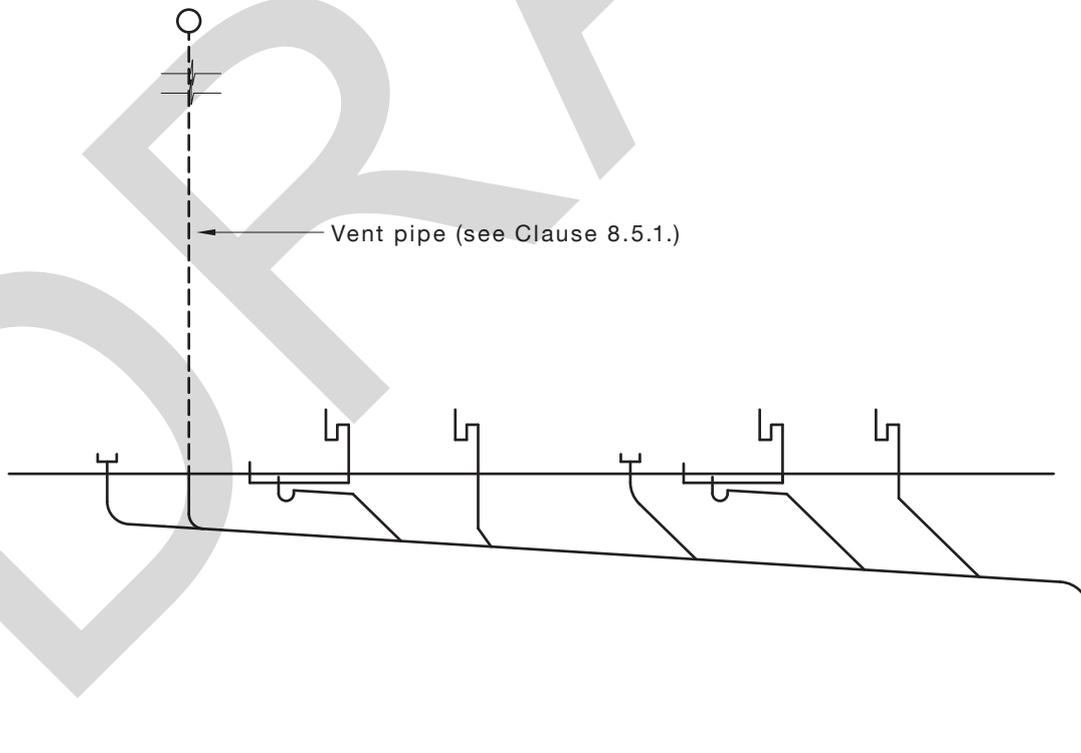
VENT CONNECTED TO GRADED PIPES
